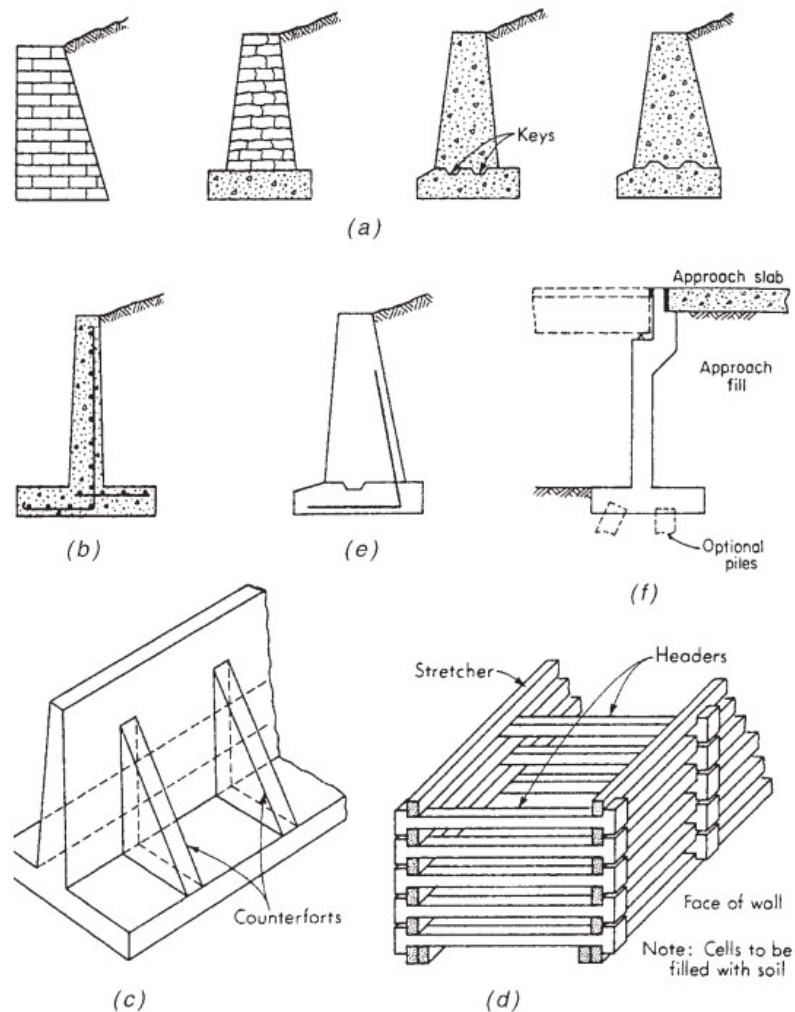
Common Types of Retaining Structures. (a) Gravity Wall; (b) Cantilever Wall; (c) Counterfort or Buttressed Wall; (d) Crib Wall; (e) Semigravity Wall; (f) Bridge Abutment [3].
